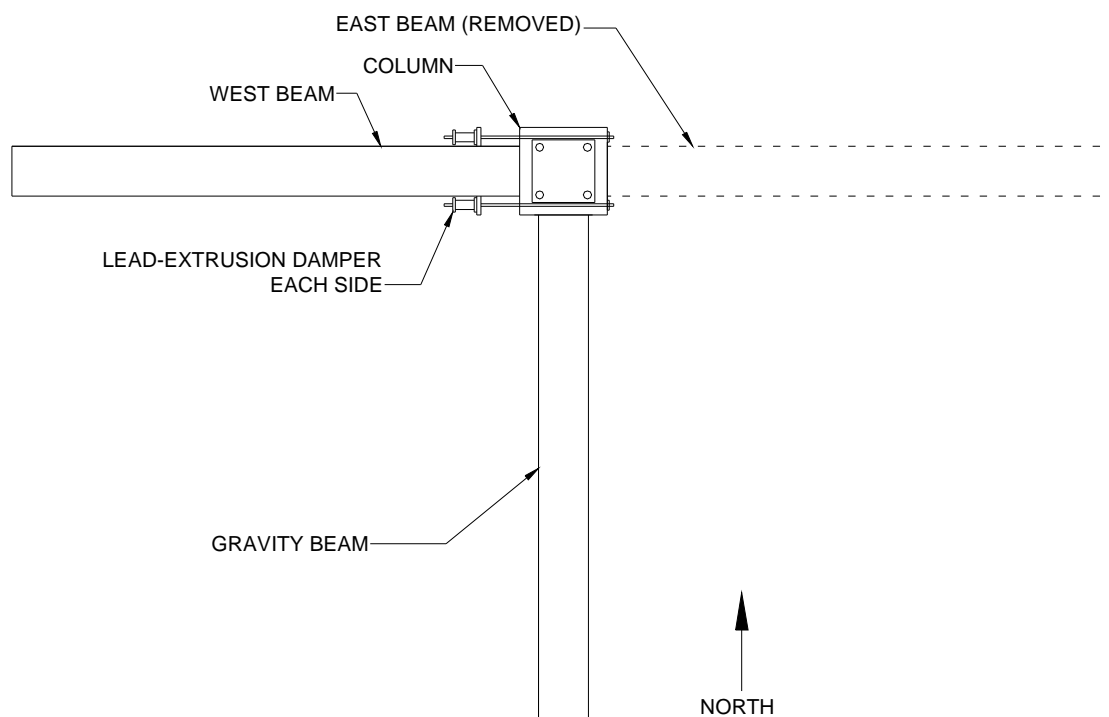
Plan view of the corner joint specimen; the east beam has been removed and its LE damper has been relocated.
